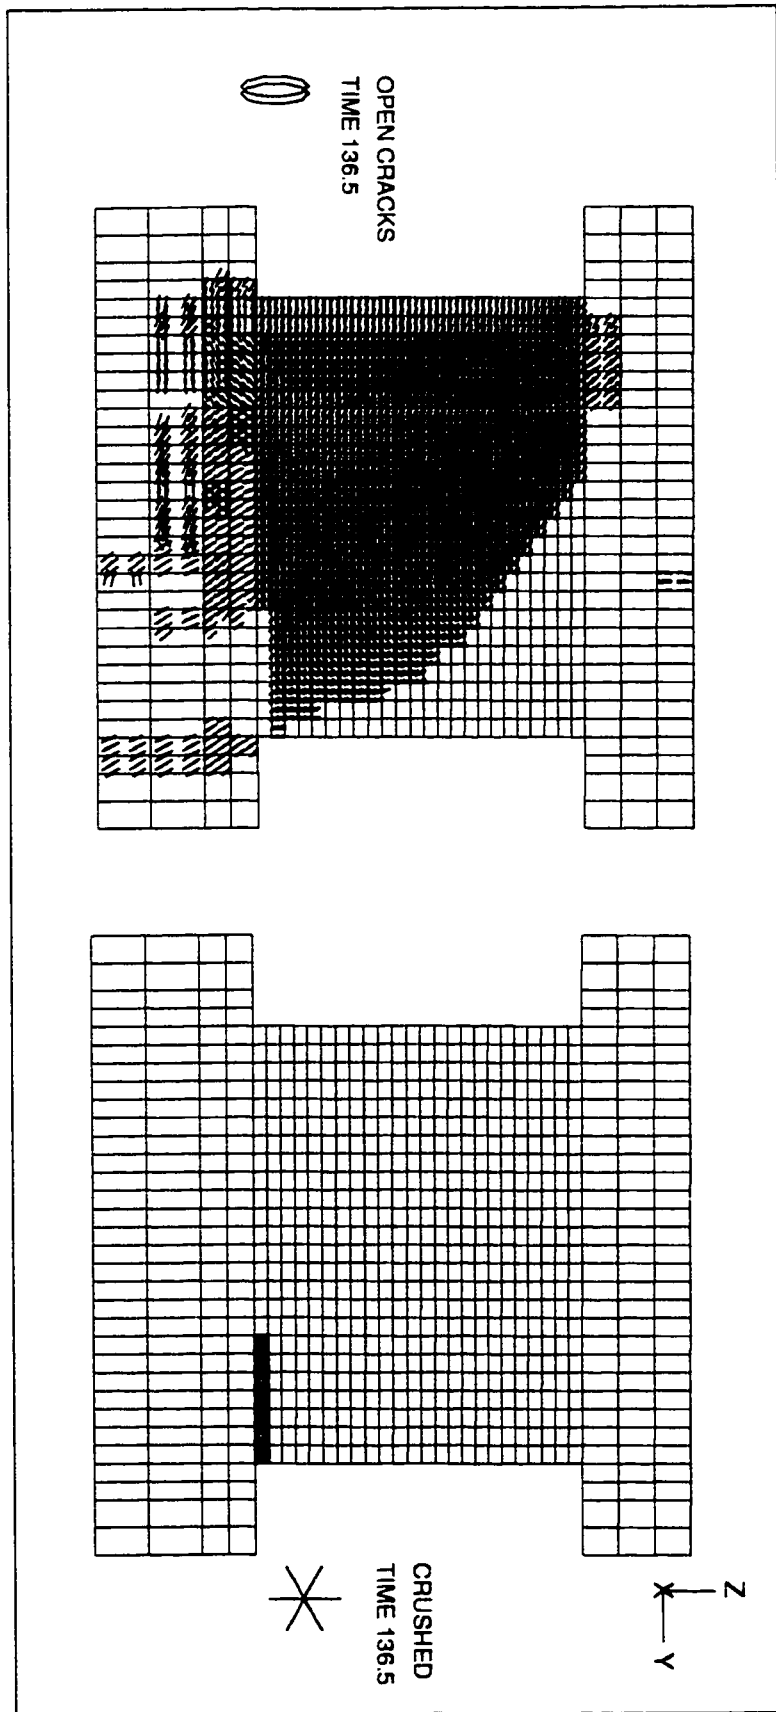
Cracking and crushing pattern of shear wall N16
